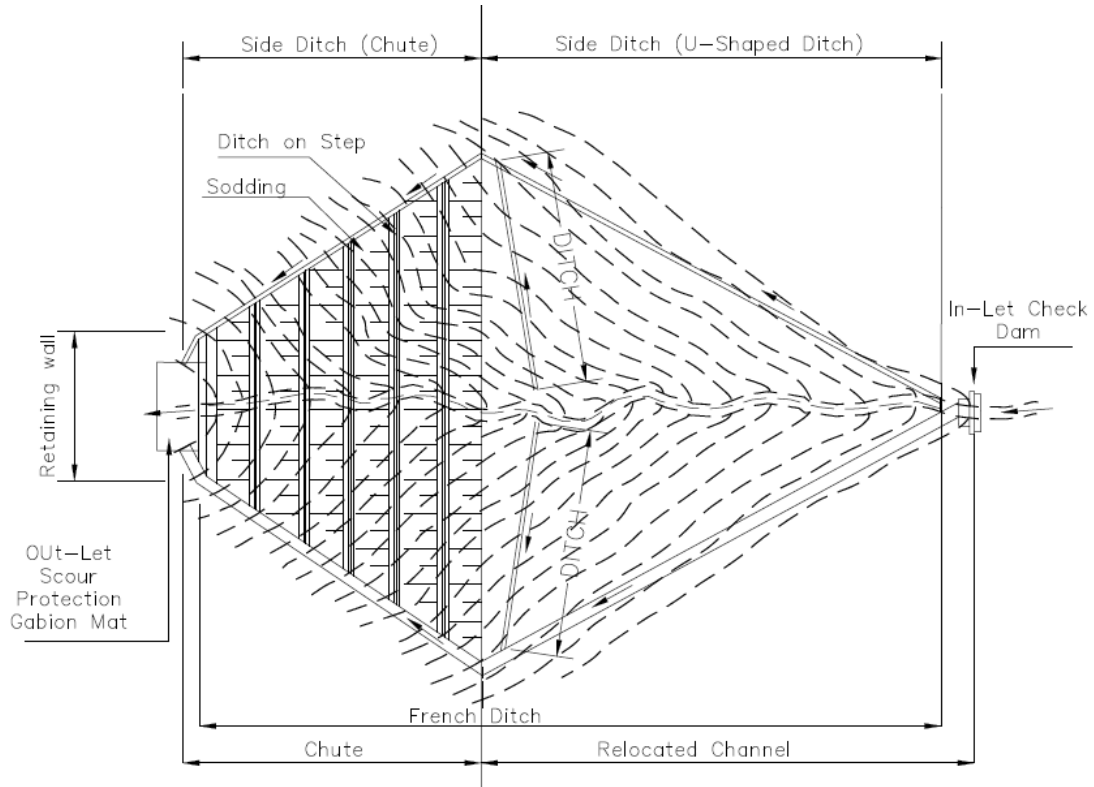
(a): Typical Arrangement for Spoil Banks: Plan
